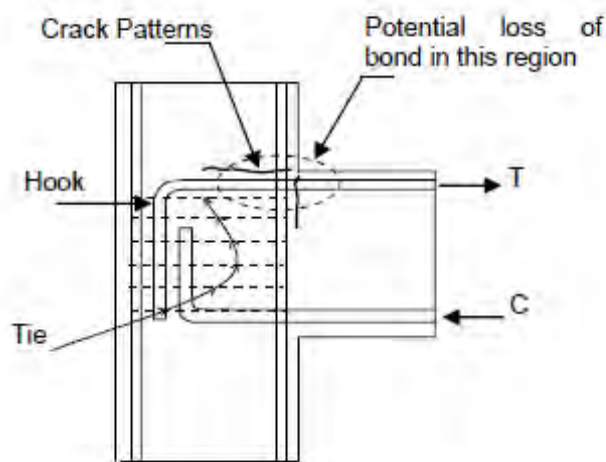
Bond Stresses in a Exterior Joint (Uma and Prasad 2006)
